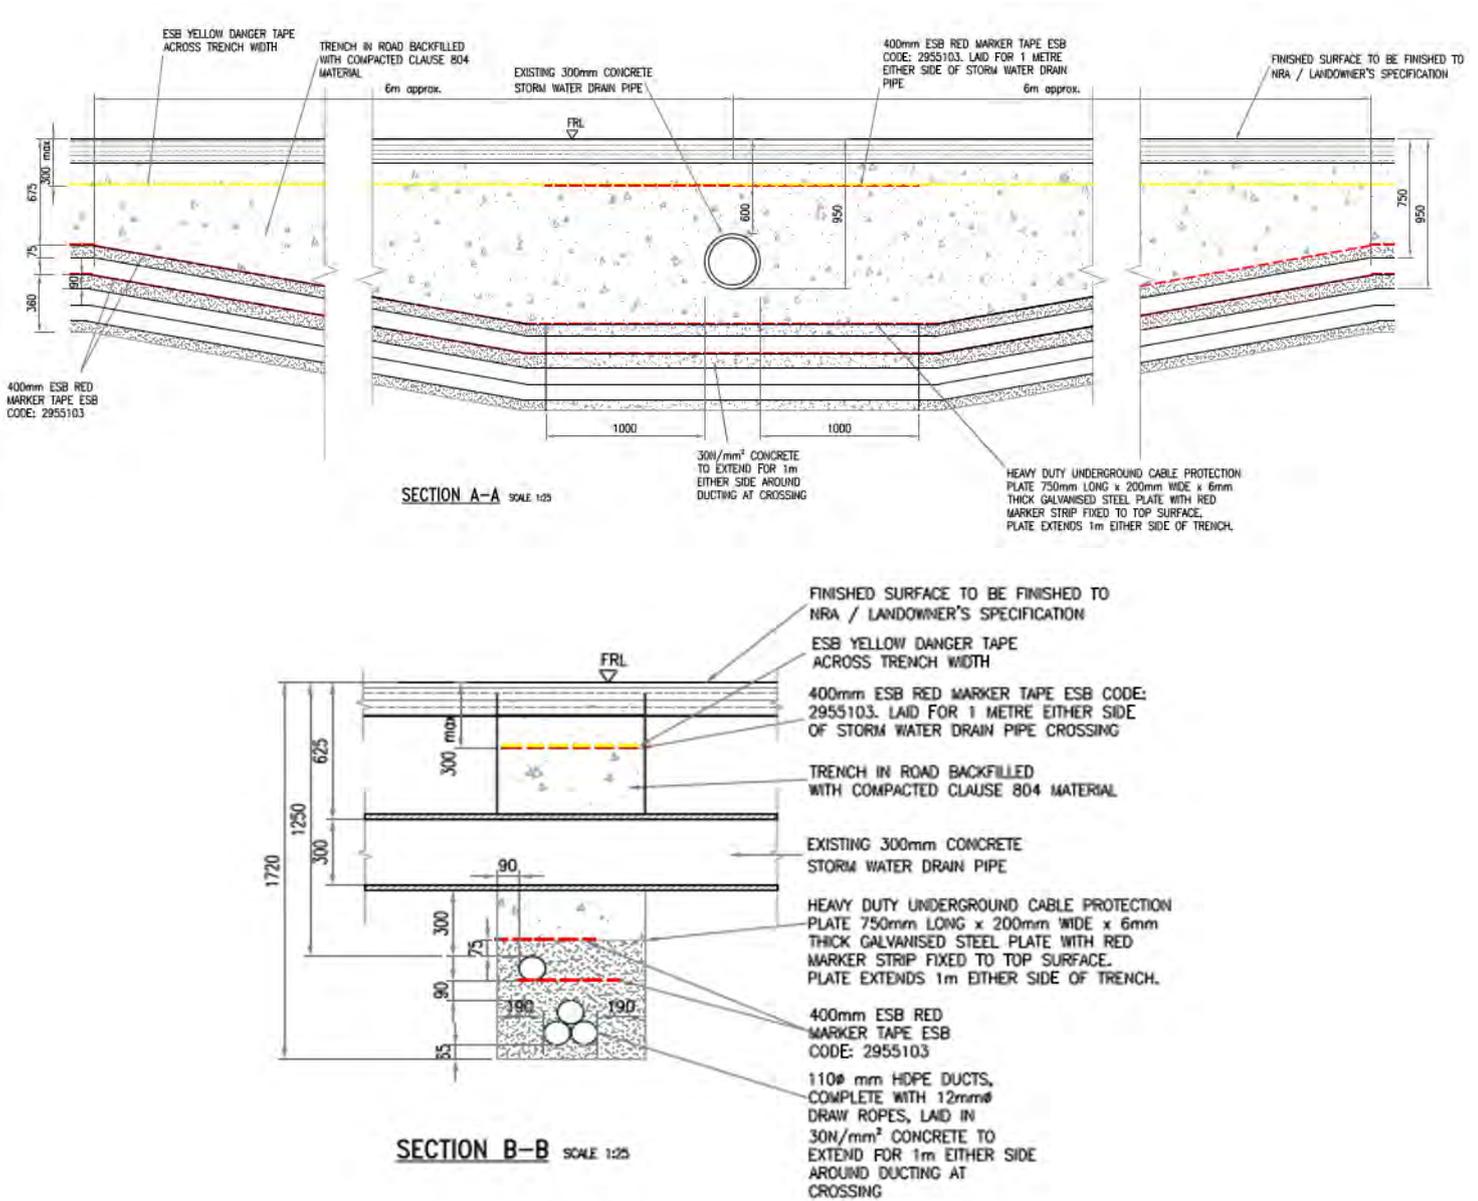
Piped Culvert Crossings - Ducting under Culvert Crossing Details
